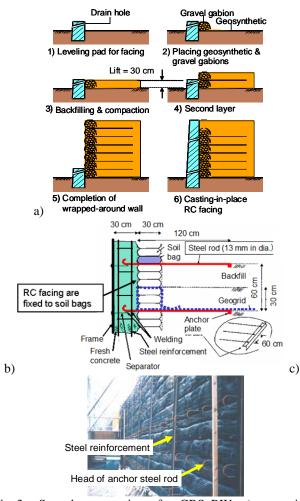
Staged construction of a GRS RW: a) respective construction steps; b) details of connection between the facing and the reinforced backfill; and c) typical view of the wall face before casting-in-place FHR facing.
